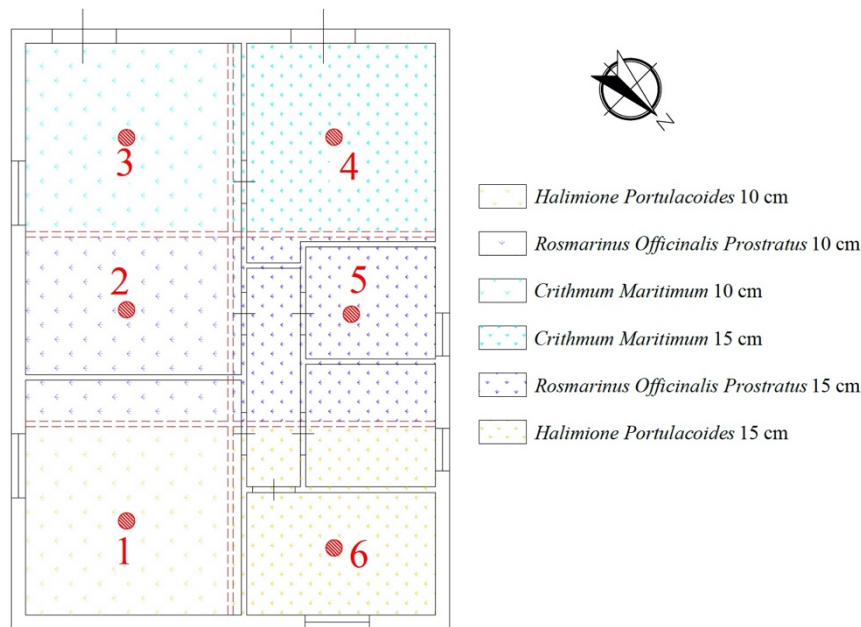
Layout of the building, green roof plots' arrangement and positions of probes for the temperature measurement.
